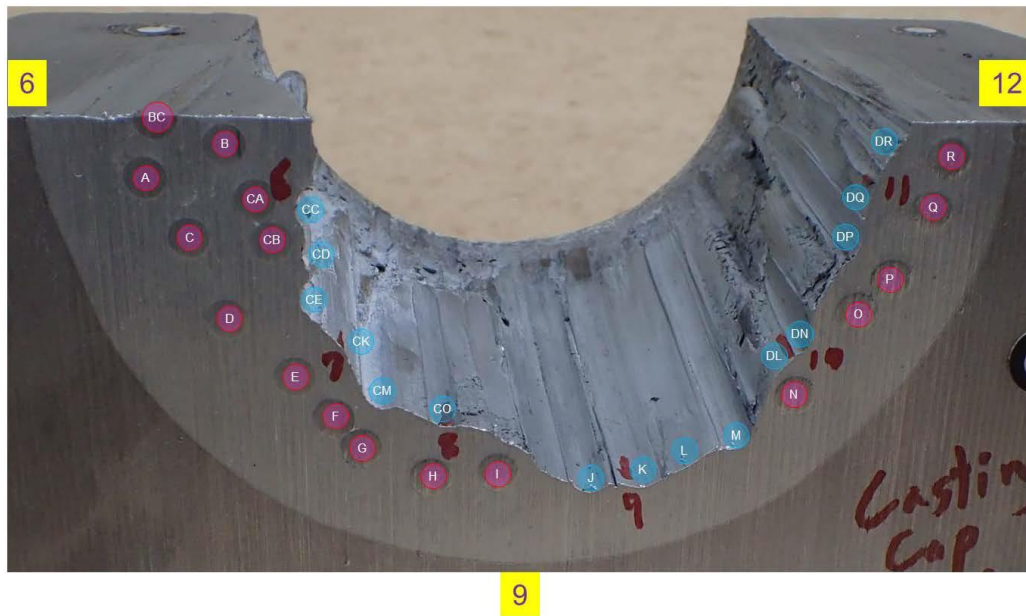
Wire map of the casting cap side of slice 9g. Pink wire labels are wires that fractured within the socket and blue wire labels are wires that remained intact.
